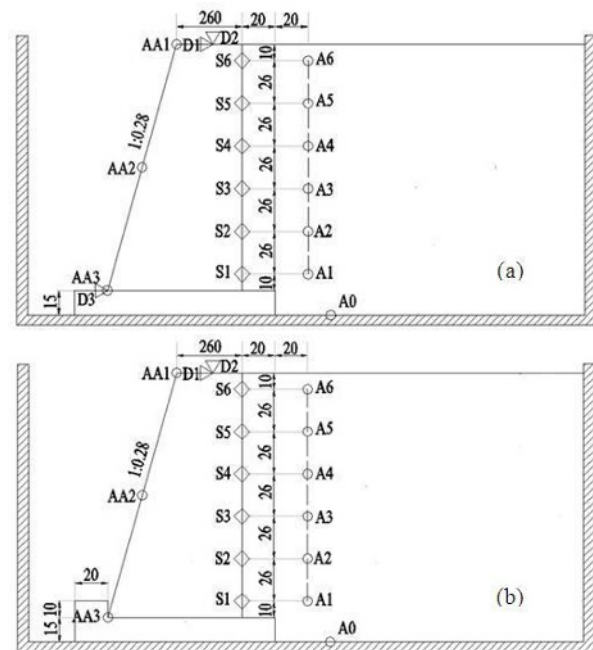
The sketch of the model, the rock foundation retaining wall (a) and the soil foundation retaining wall (b) (unit: cm).
